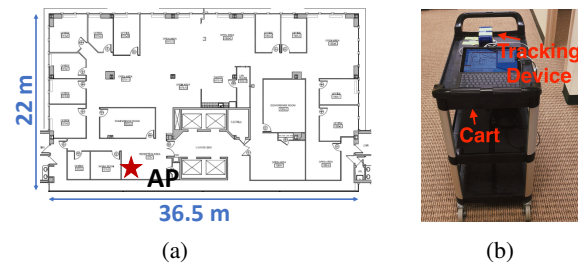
Ground-truth floor plan and device setup. (a) Ground-truth floor plan. (b) Data collection device setup.
